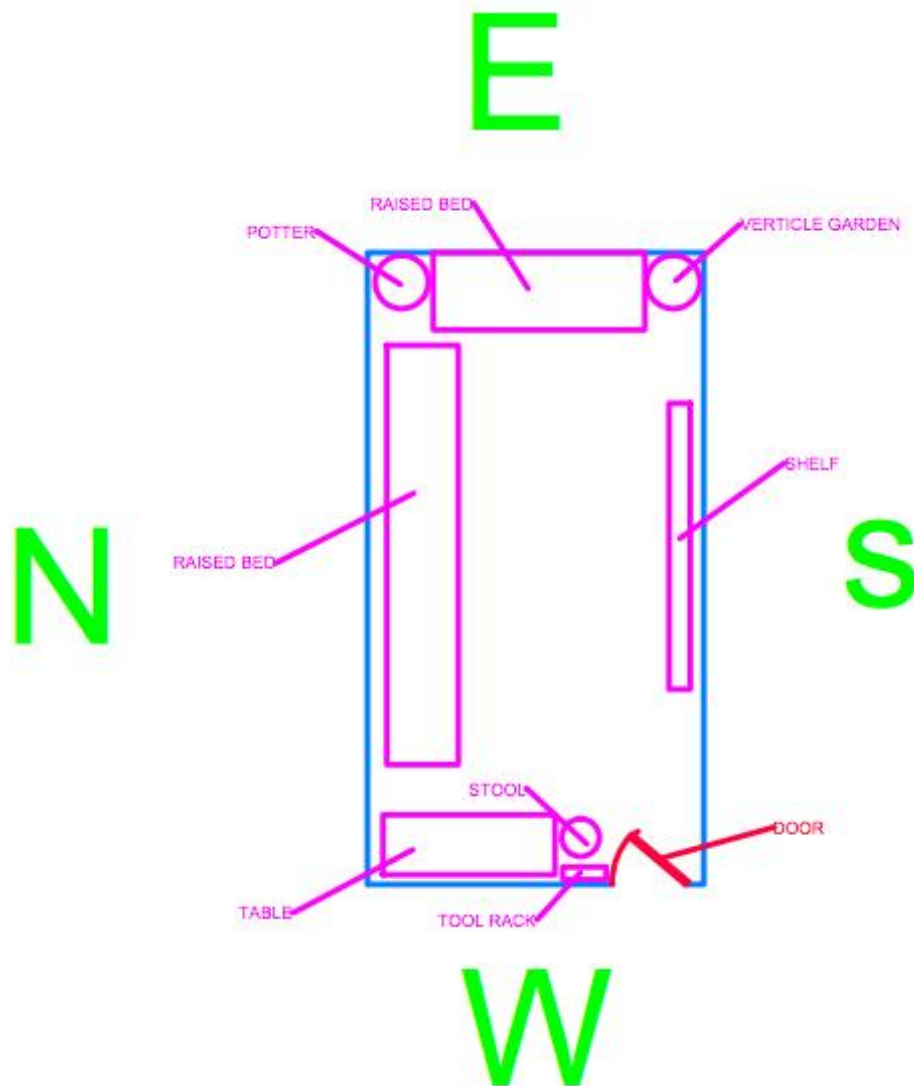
CAD drawing of interior layout of Redwood Gardens (Drawn by: Raymond Rios 10/12/2014)
